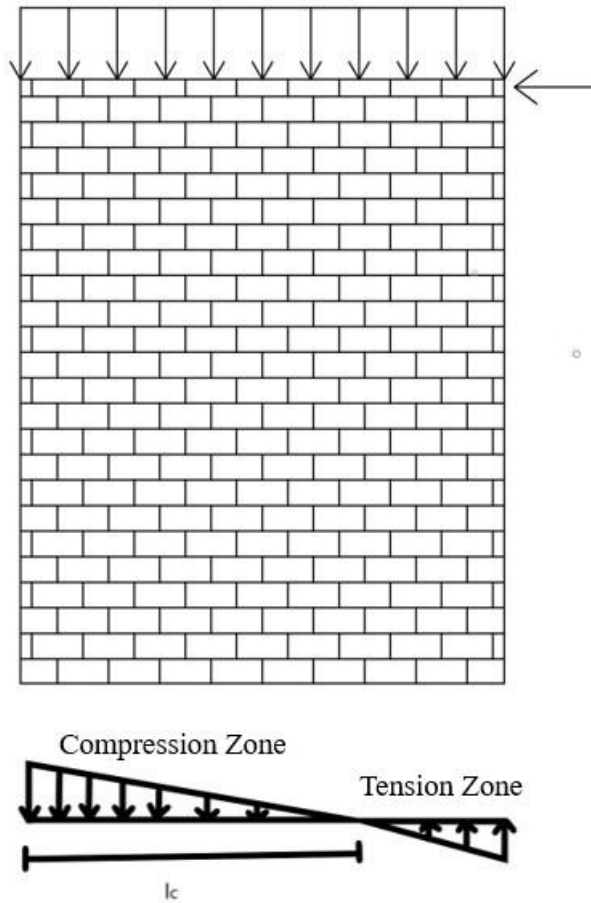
Linear Stress Distribution of Wall Under Vertical and Lateral Loadings
